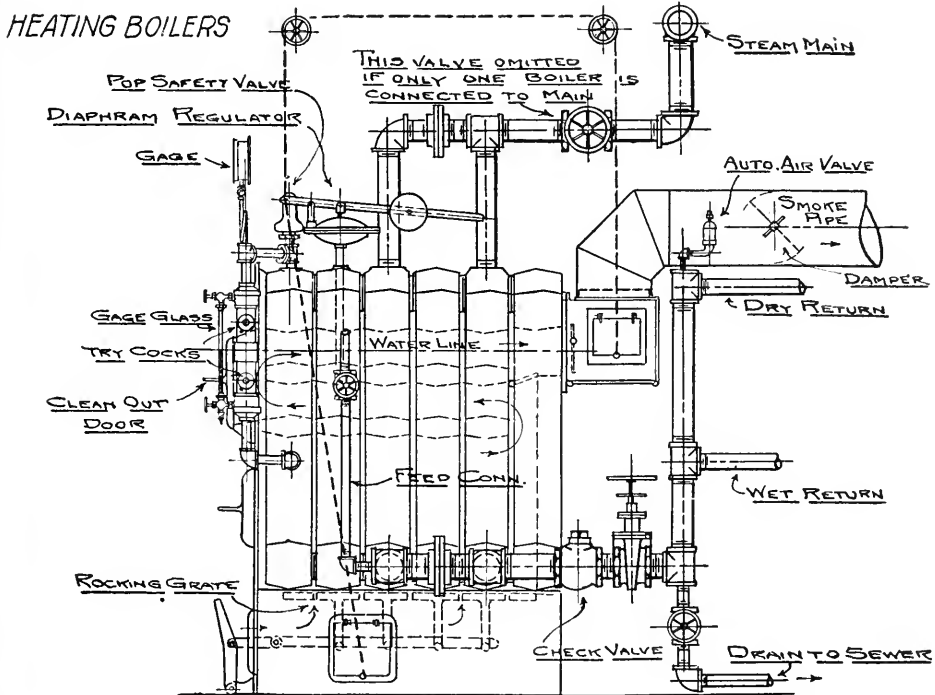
TRIMMINGS AND CONNECTIONS FOR SECTIONAL STEAM HEATING BOILER
